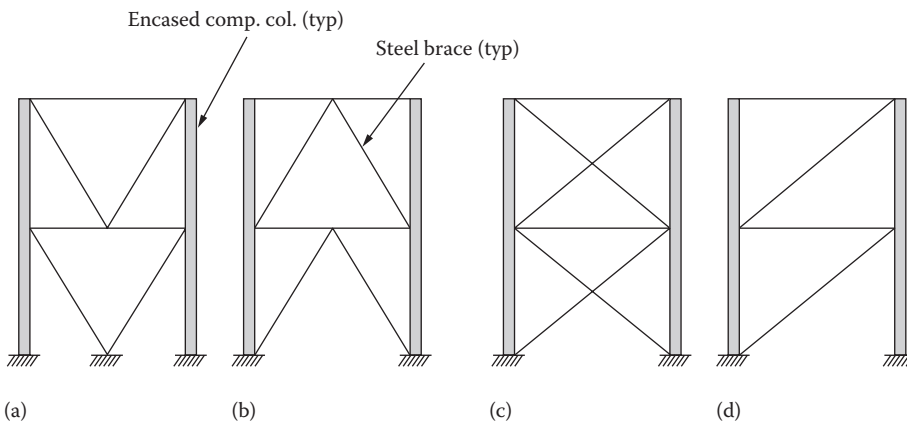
Composite concentrically braced frames: (a) V-bracing; (b) inverted V-bracing; (c) X-bracing; (d) diagonal bracing. (Continued)
